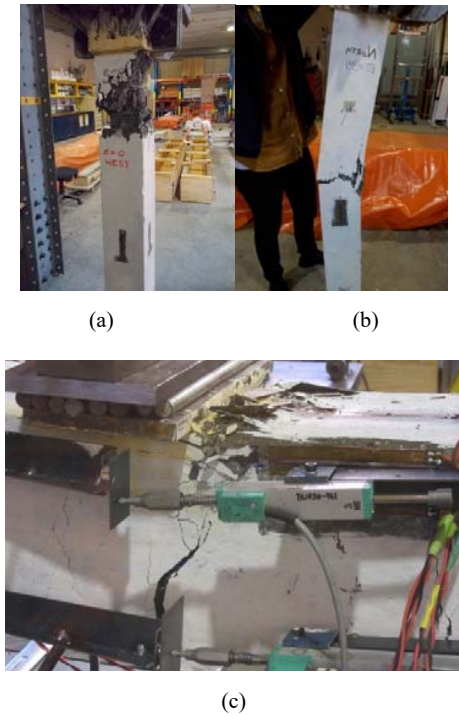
Failure modes of (a) concentrically loaded column (b) eccentrically loaded column (c) beam under four-point bending
